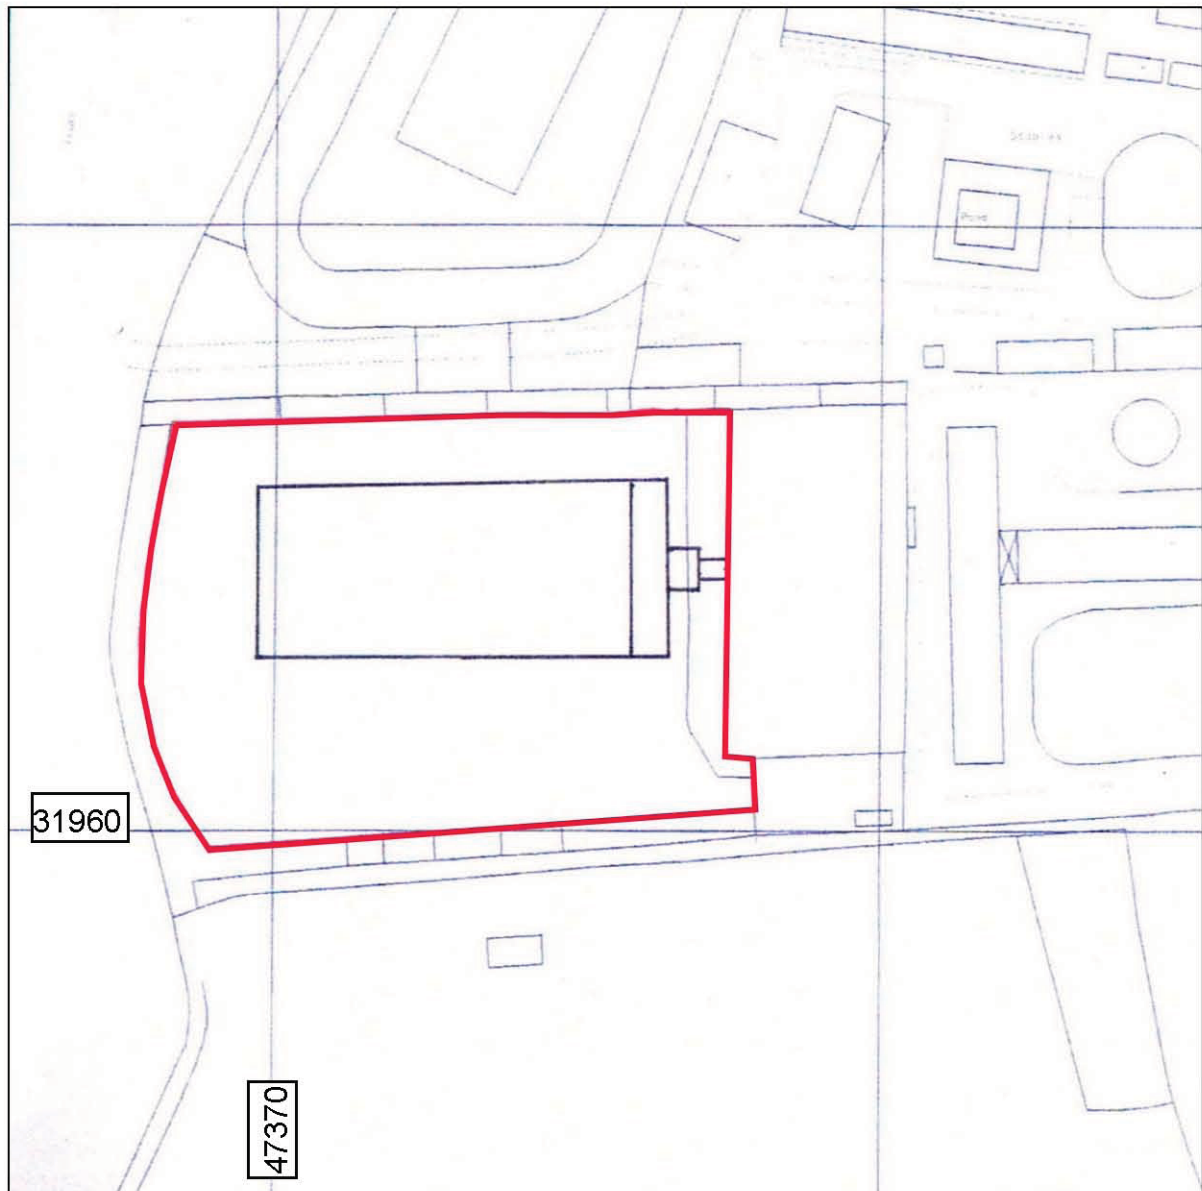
Site Plan showing Proposed Development (scale 1:1250)
